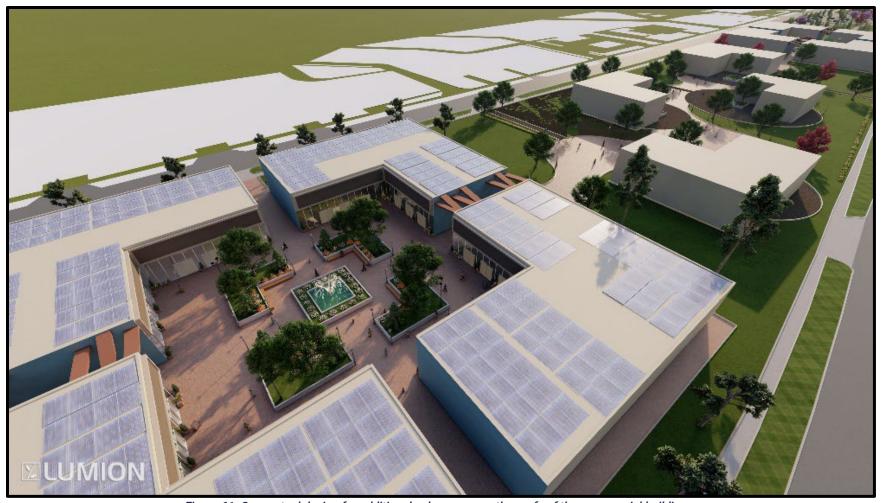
Conceptual design for additional solar arrays on the roofs of the commercial buildings
